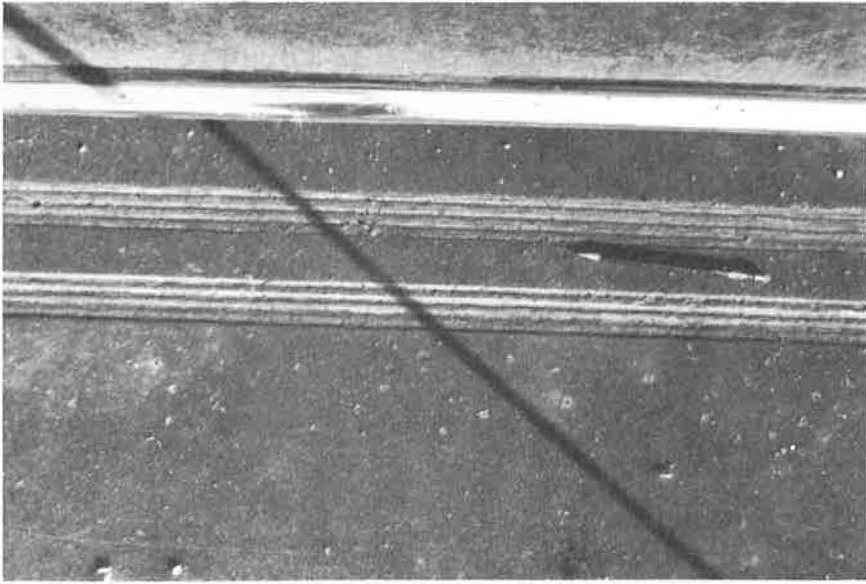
Special test no. 2; icy portland cement concrete surface after three applications of rapid starts.
